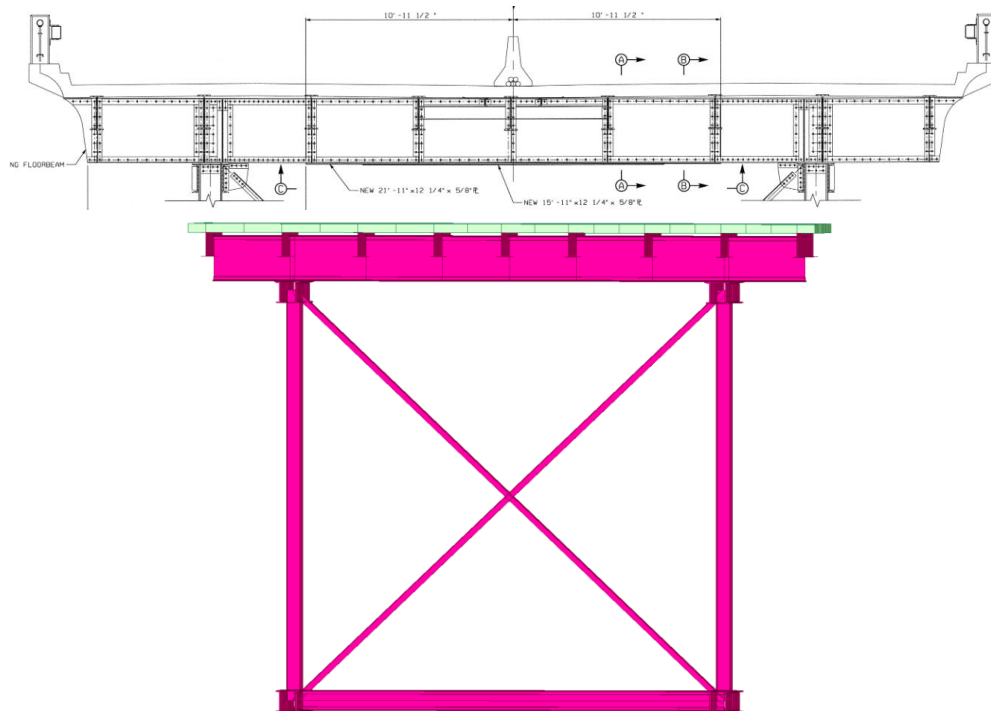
View of typical cross section: technical drawing (top) and FE model (bottom) - Truss_5.
